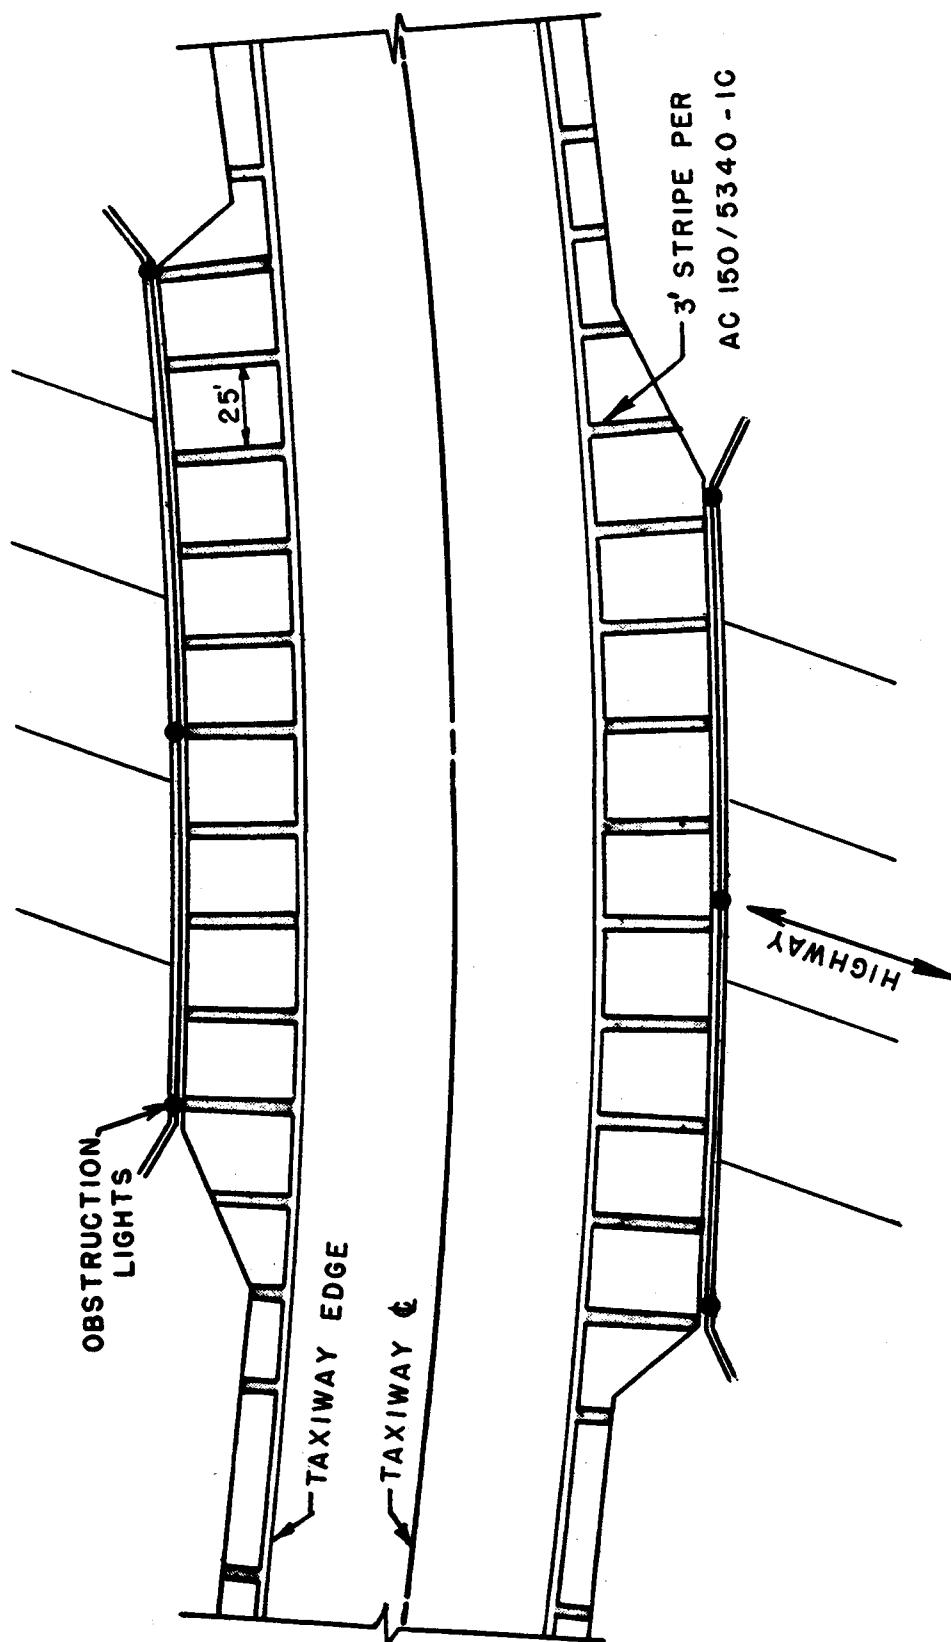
Suggested shoulder marking of minimum width taxiway bridge
